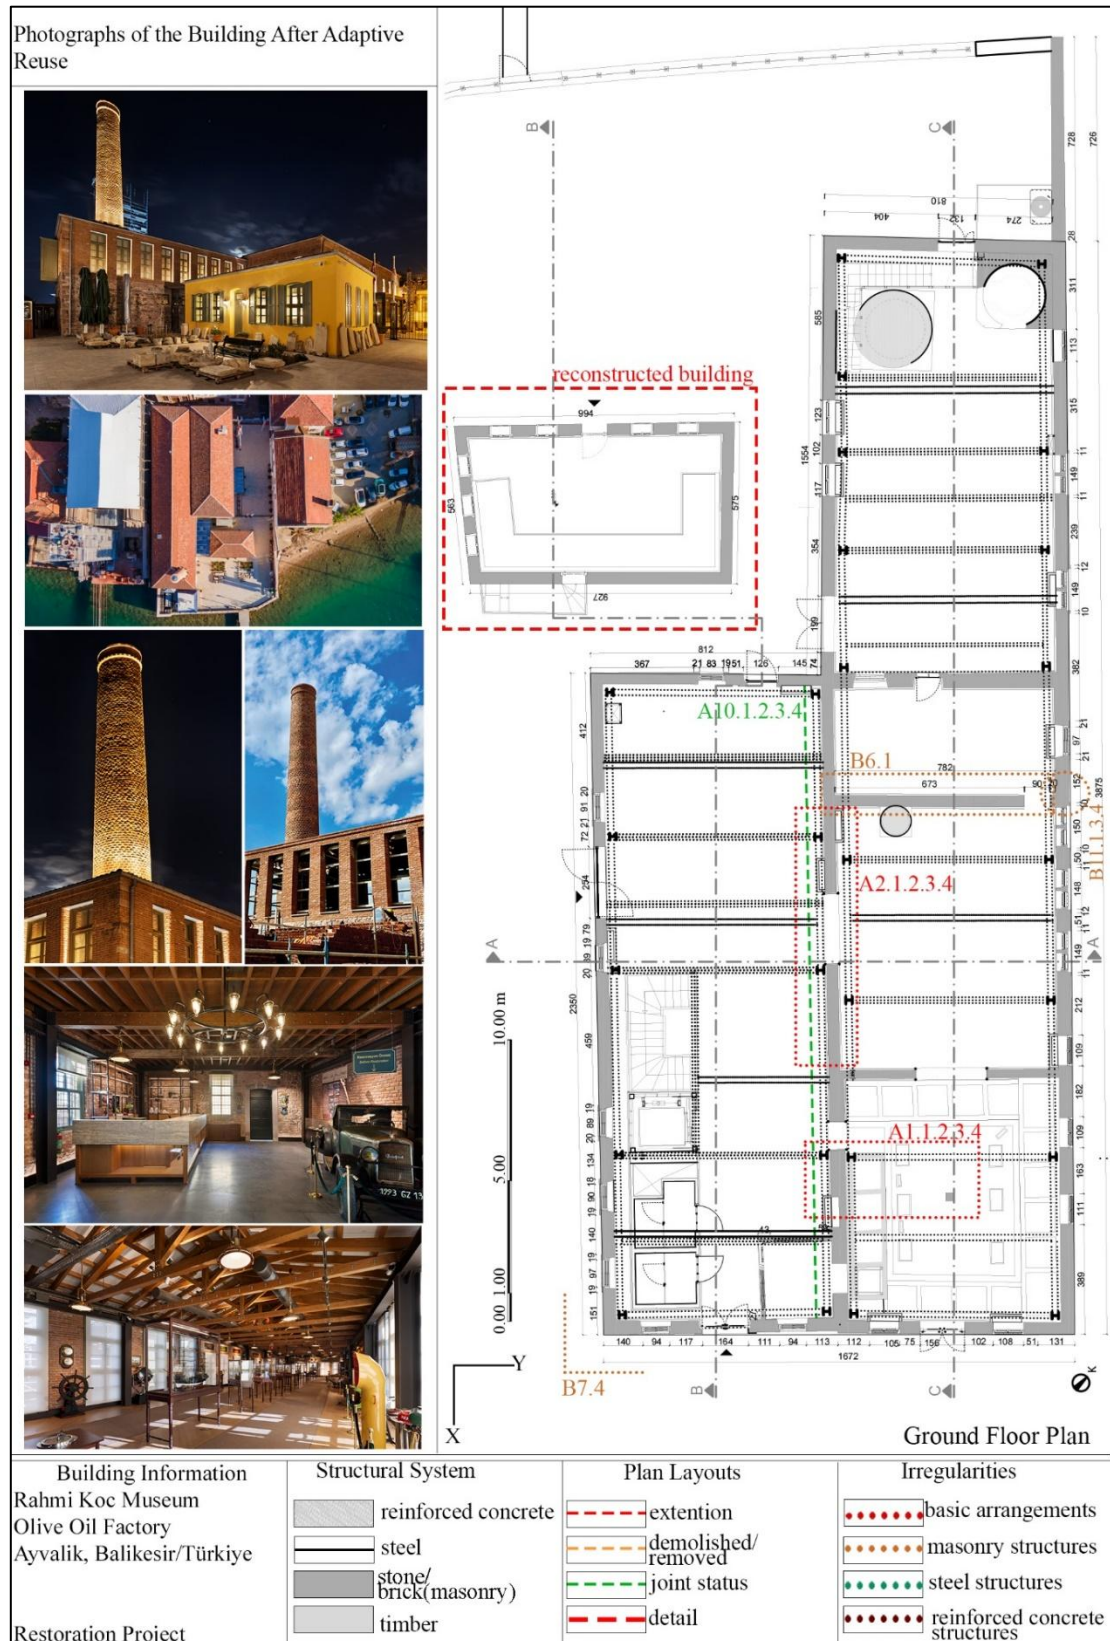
Ground Floor Plan and Photographs (Modified by the author based on EMR Architecture, 2024.)
